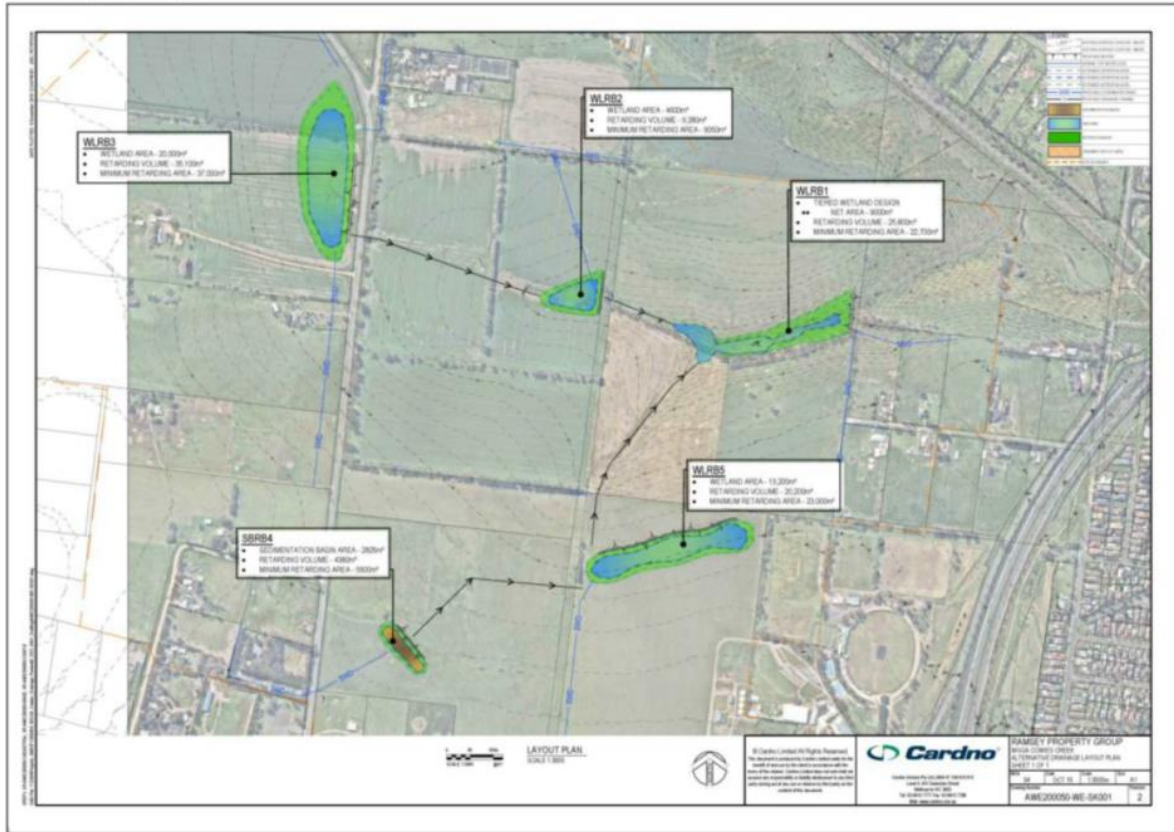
Proposed alternate drainage layout (Cardno, 2020)
